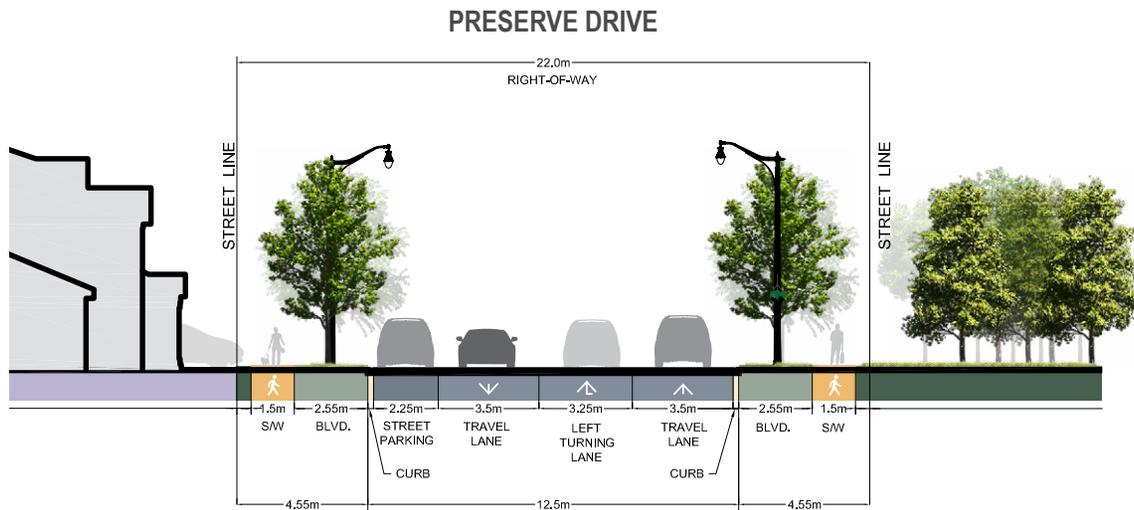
Cross-section of 22m Preserve Drive Collector Road Right-of-Way looking north
